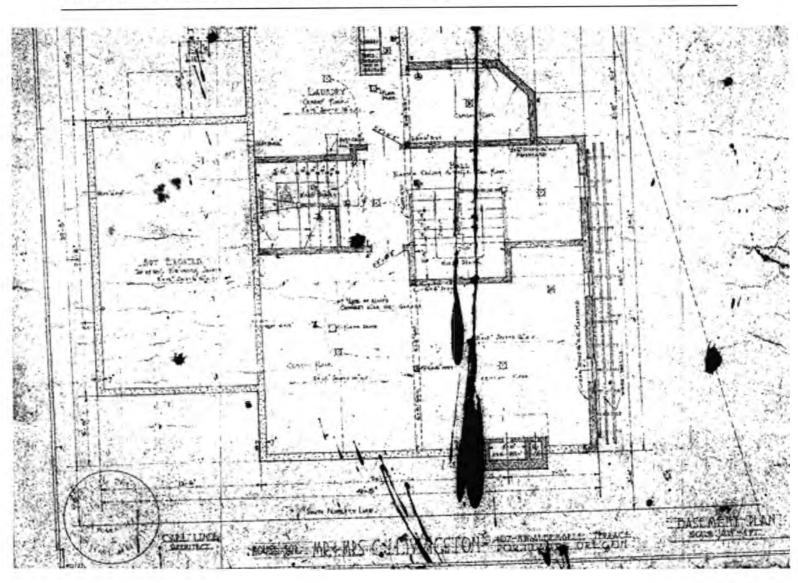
Original drawing for the C.J. Livingston House, showing first floor (or "basement") plan.
